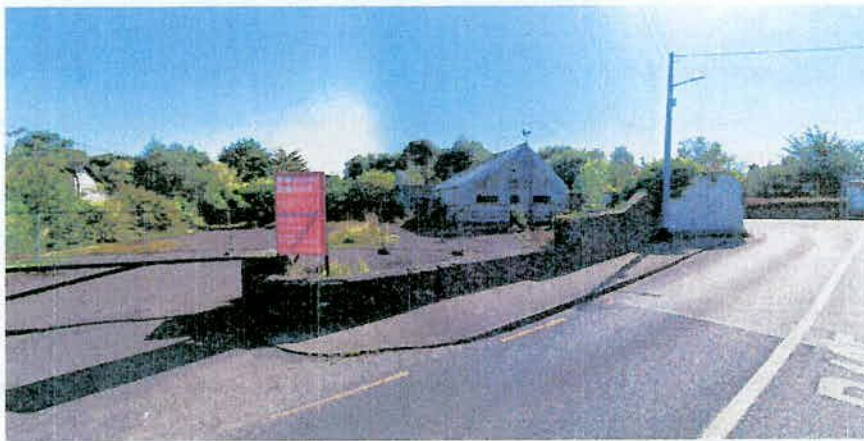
Photographs of the site taken from Hazelhatch Road.
